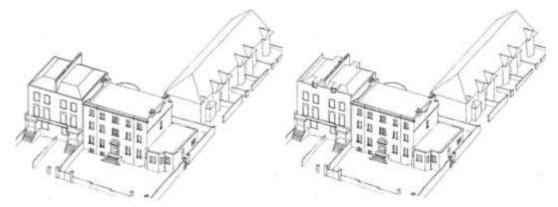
& 60: Grove End House after third storey added and roof conversion of Lynton Villas
